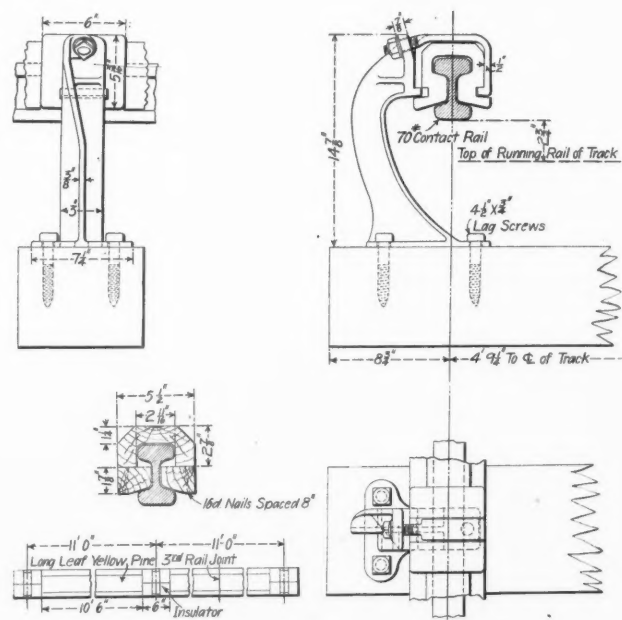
Detail of Supporting Brackets and Wood Protection, New York Central Type of Third-Rail.
